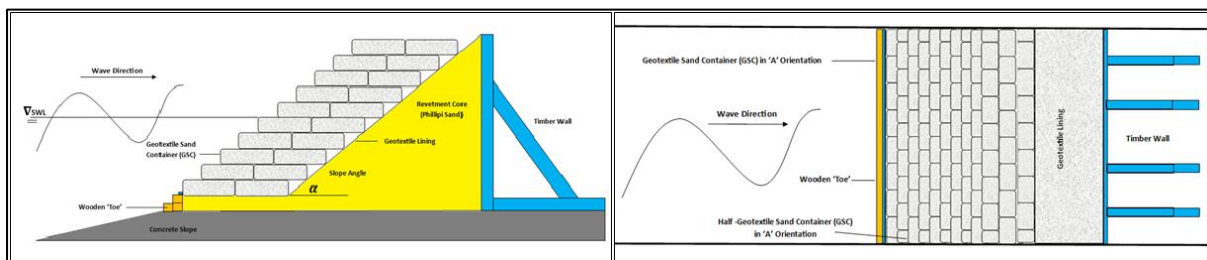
Schematic Cross-section (Left) and Plan View (Right) of GSC Revetment for Test Series 3
